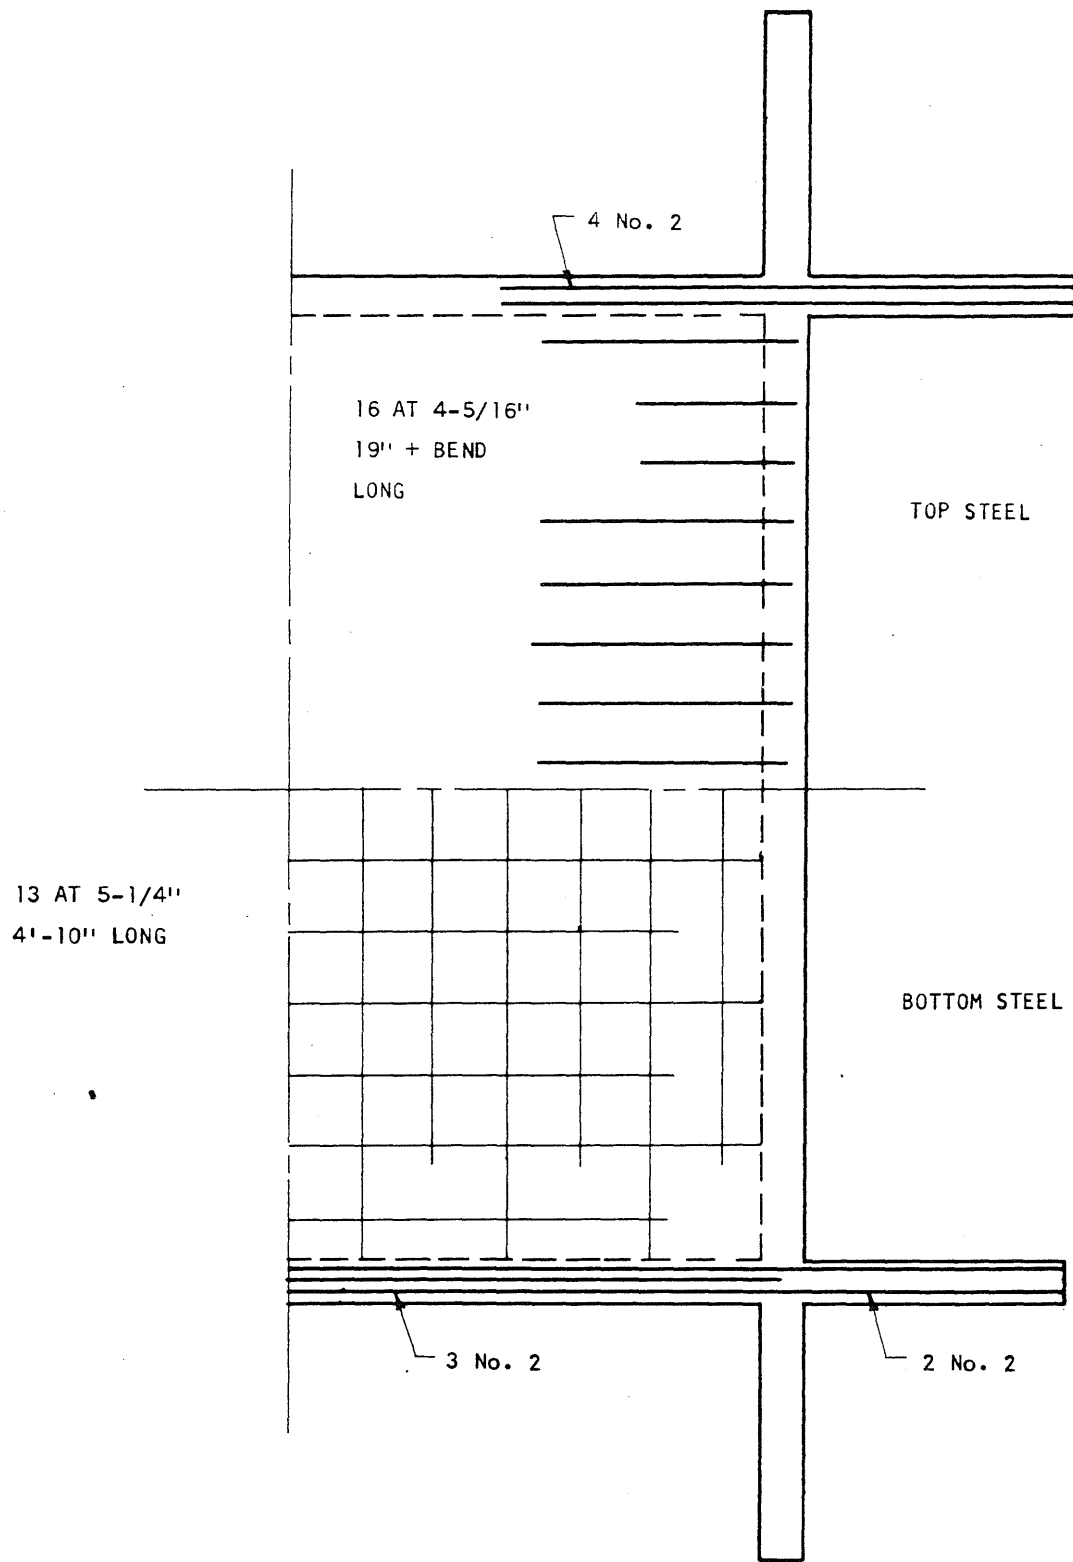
SLAB REINFORCEMENT, FS 1, 2, 3
